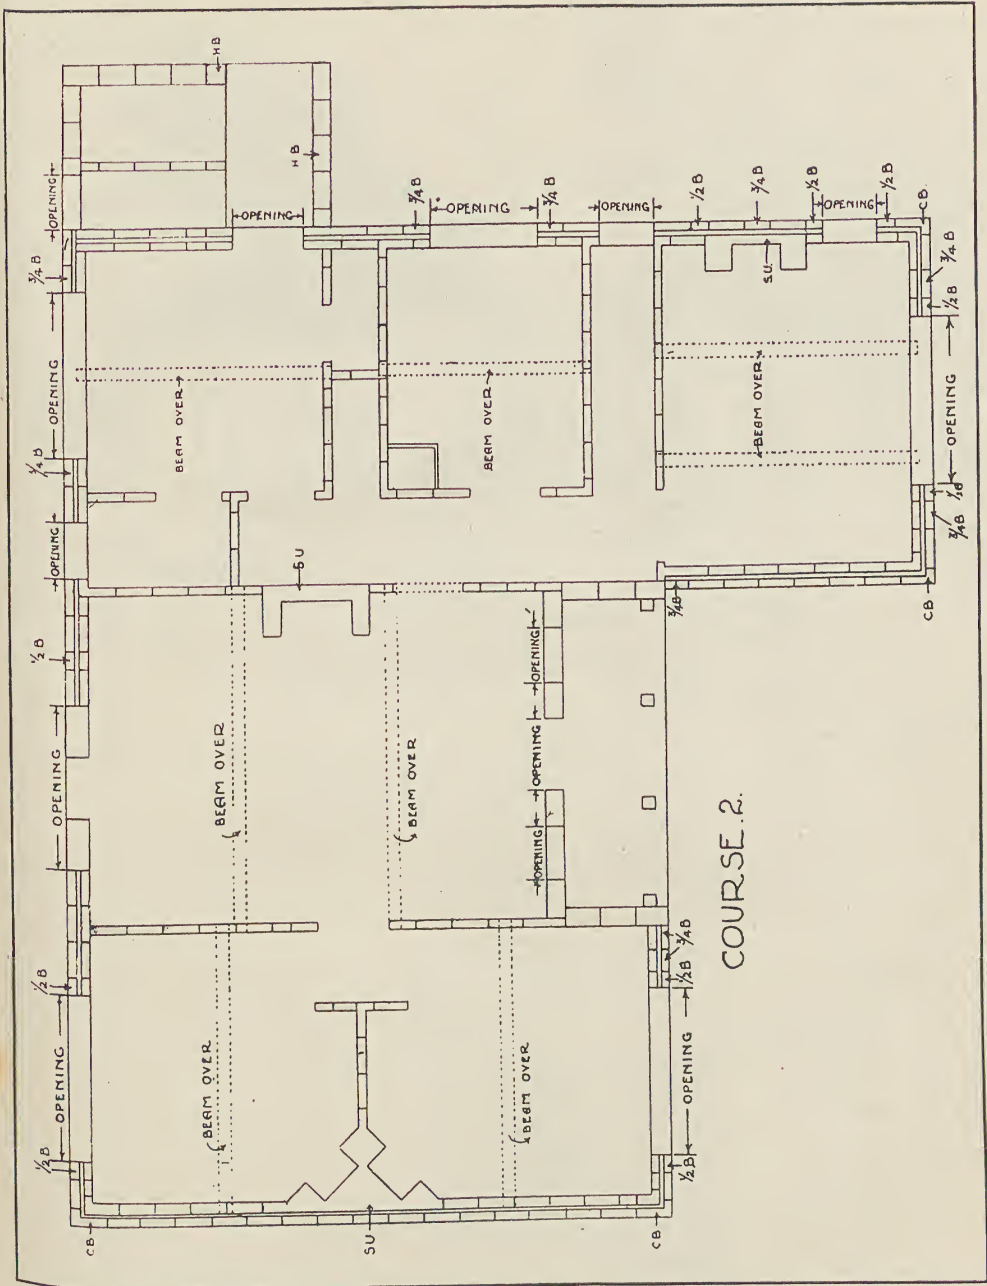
TYPE No. 4: PLAN SHOWING BONDING OF BLOCKS.
